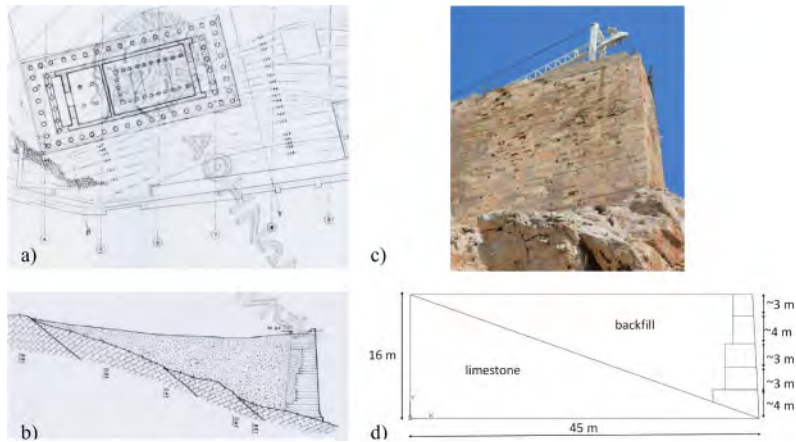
a) Plan view of the area under examination, b) representative cross section of the southern wall (Psarropoulos et al. 2018; Trikkalinos 1972, 1977), c) the southeast corner of the wall and d) the geometry of the wall considered herein.
